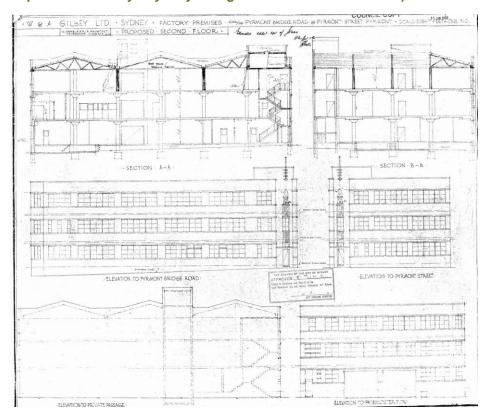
1950 – Amended elevations and sections for proposed second floor (third storey) for W & A Gilbey Ltd Factory Premises, by C. Orme, architect, approved 27 January 1950 (Source: City of Sydney Archives, Pyrmont Bridge Rd NW cnr & Pyrmont St (adjacent No 135), new building (01/01/1947 - 31/12/1947), [A-00572010]. https://archives.cityofsydney.nsw.gov.au/nodes/view/1437047)
